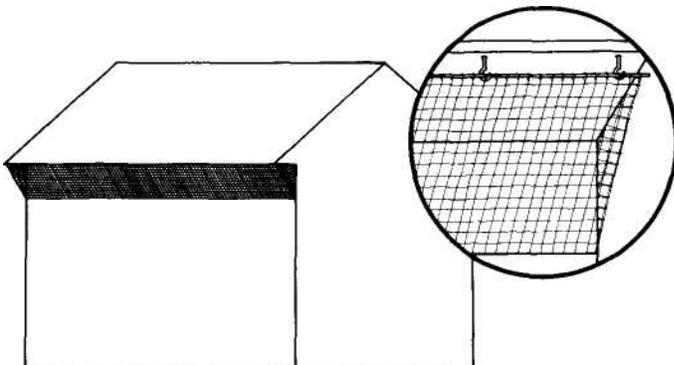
Netting mounted on building from outside edge of eave down to the side of the building. Insert shows a method of attachment using hooks and dowels.
